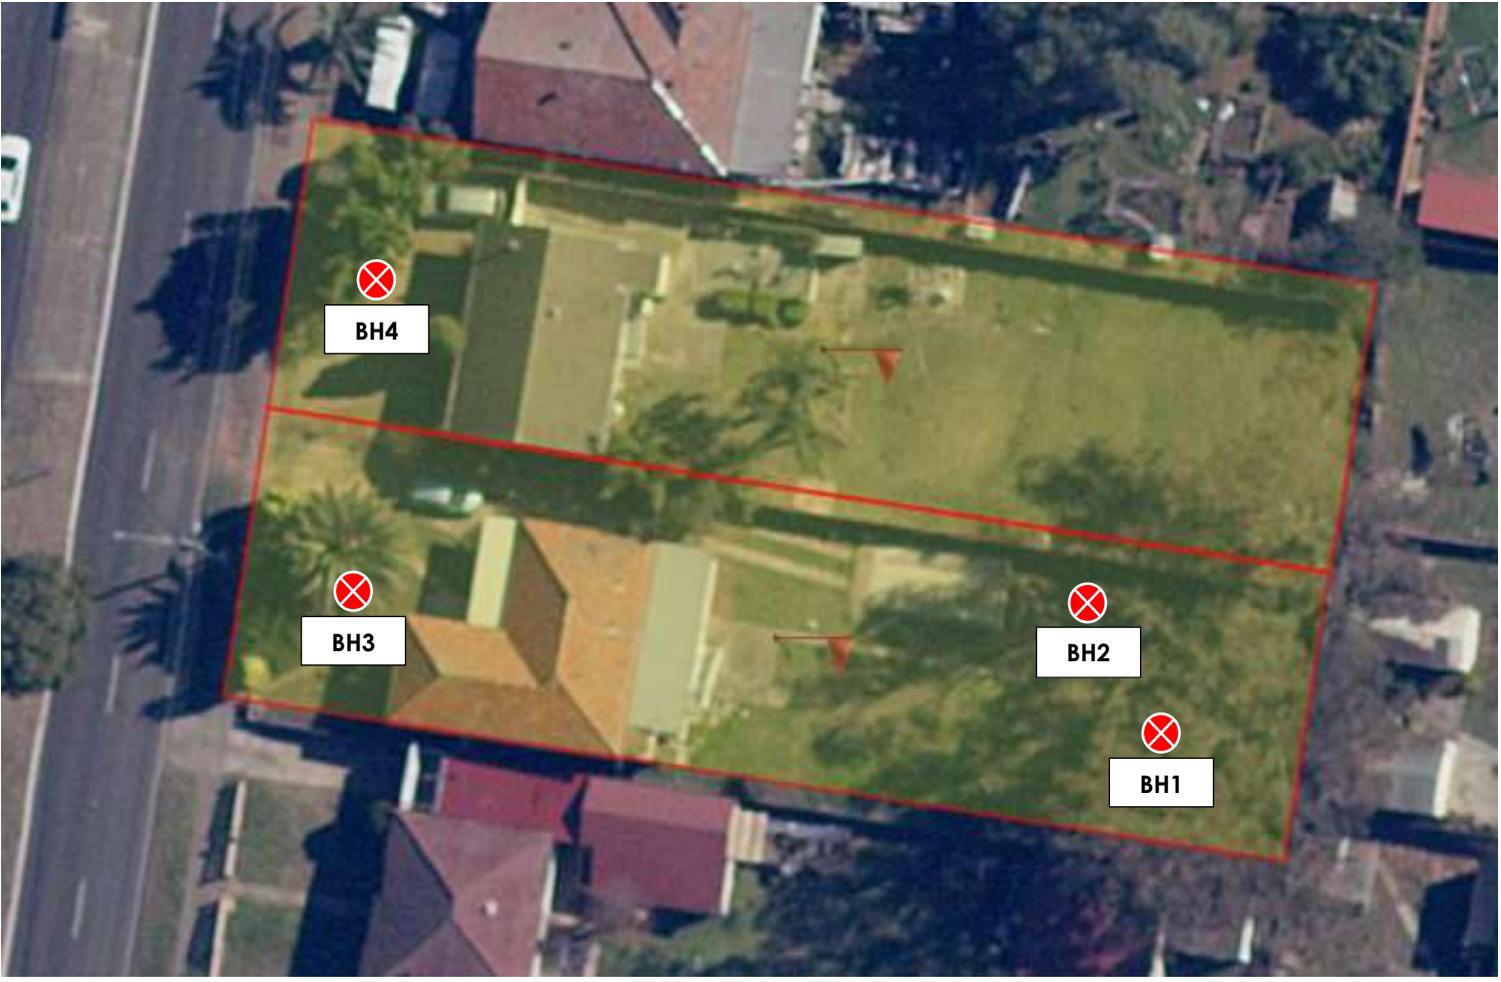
Site Plan	Geotechnical Investigation	Drawn: GN/GA
